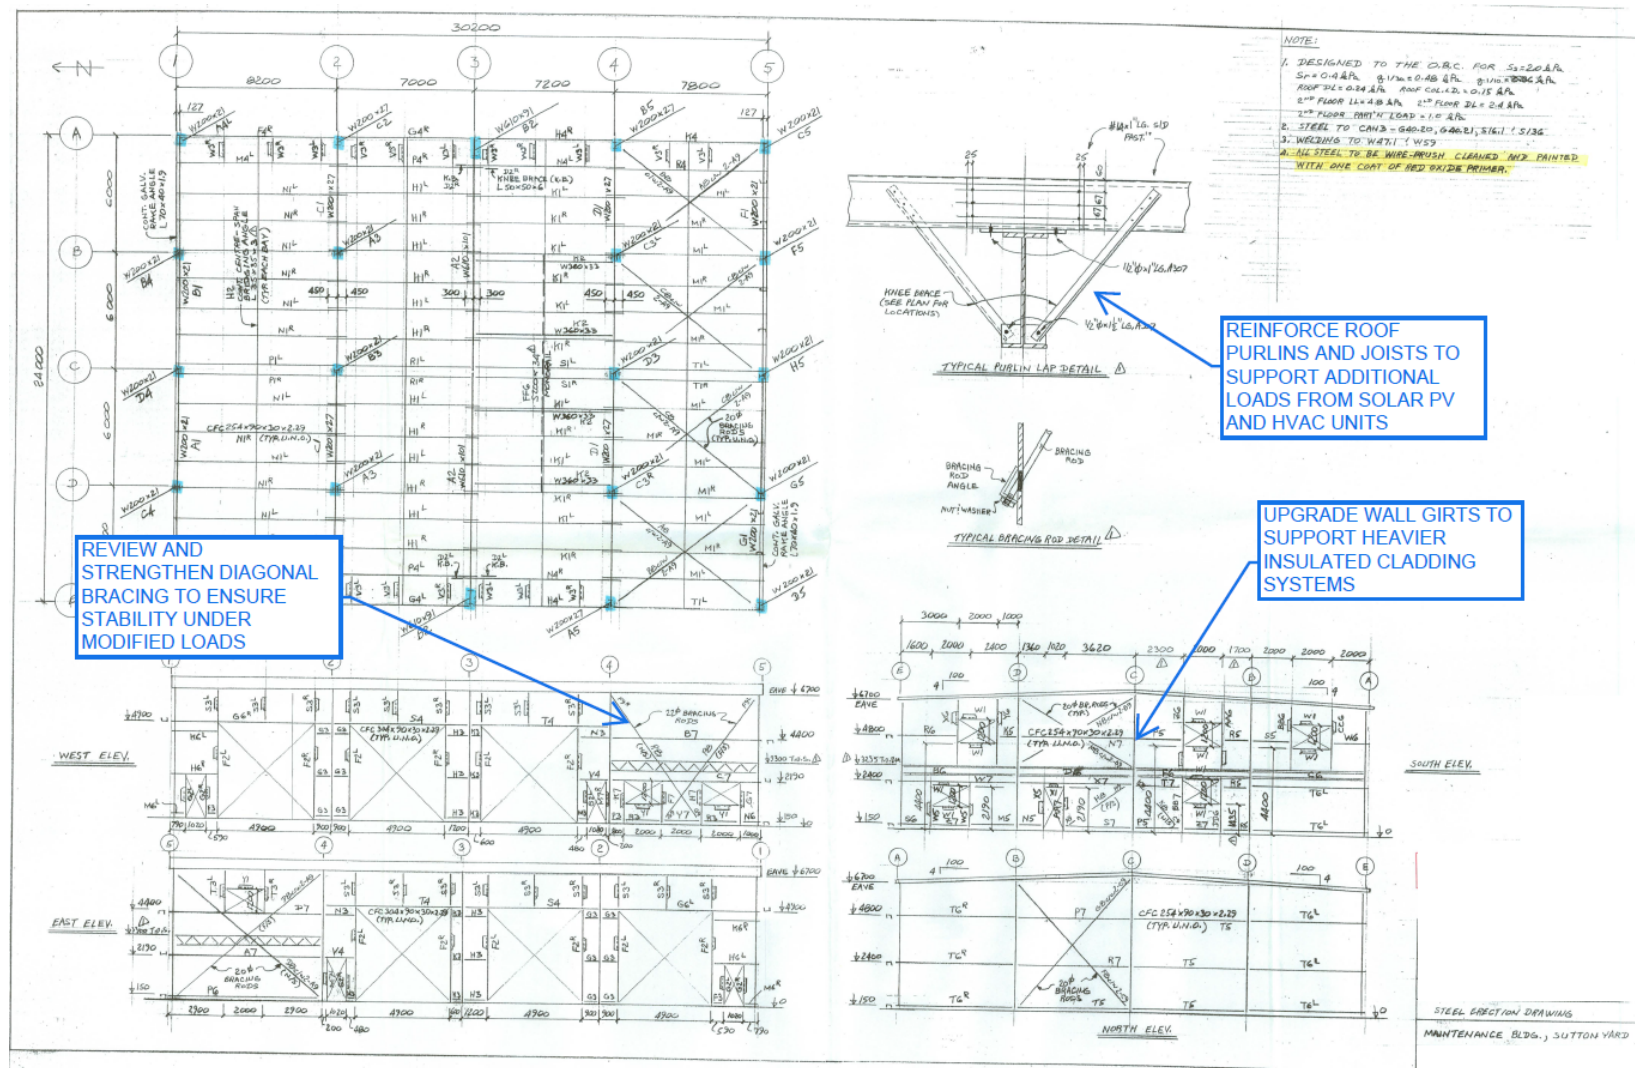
Structural framing plan annotated to highlight roof reinforcement, wall girt upgrades and bracing review.
